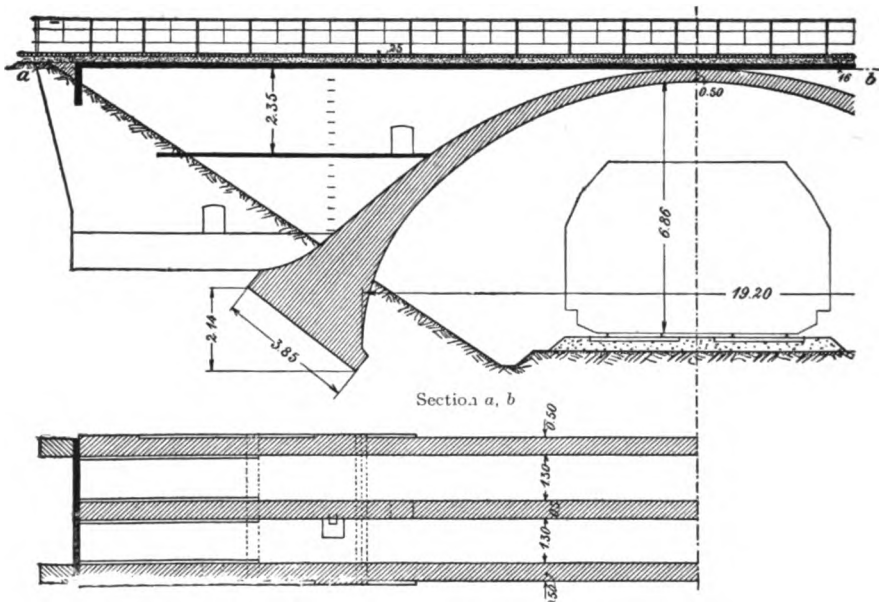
Highway bridge near Hamburg. Longitudinal and horizontal sections.
